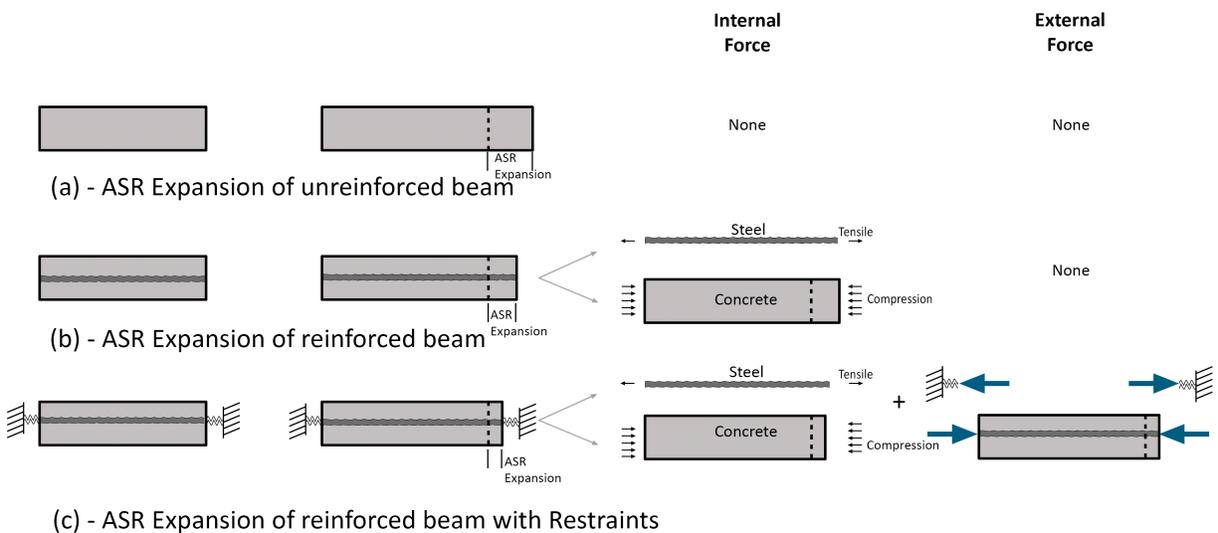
Schematic Expansion of a Concrete Beam Affected by ASR
